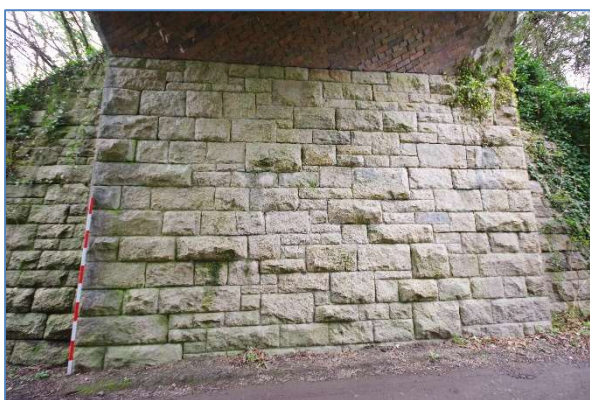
LHB05 Lighthouse Bridge southern abutment, looking south.
